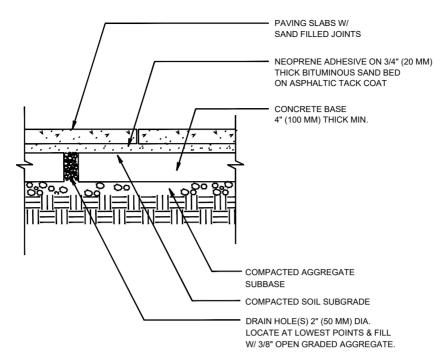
Typical cross section of bitumen-set paving slabs on a concrete base
